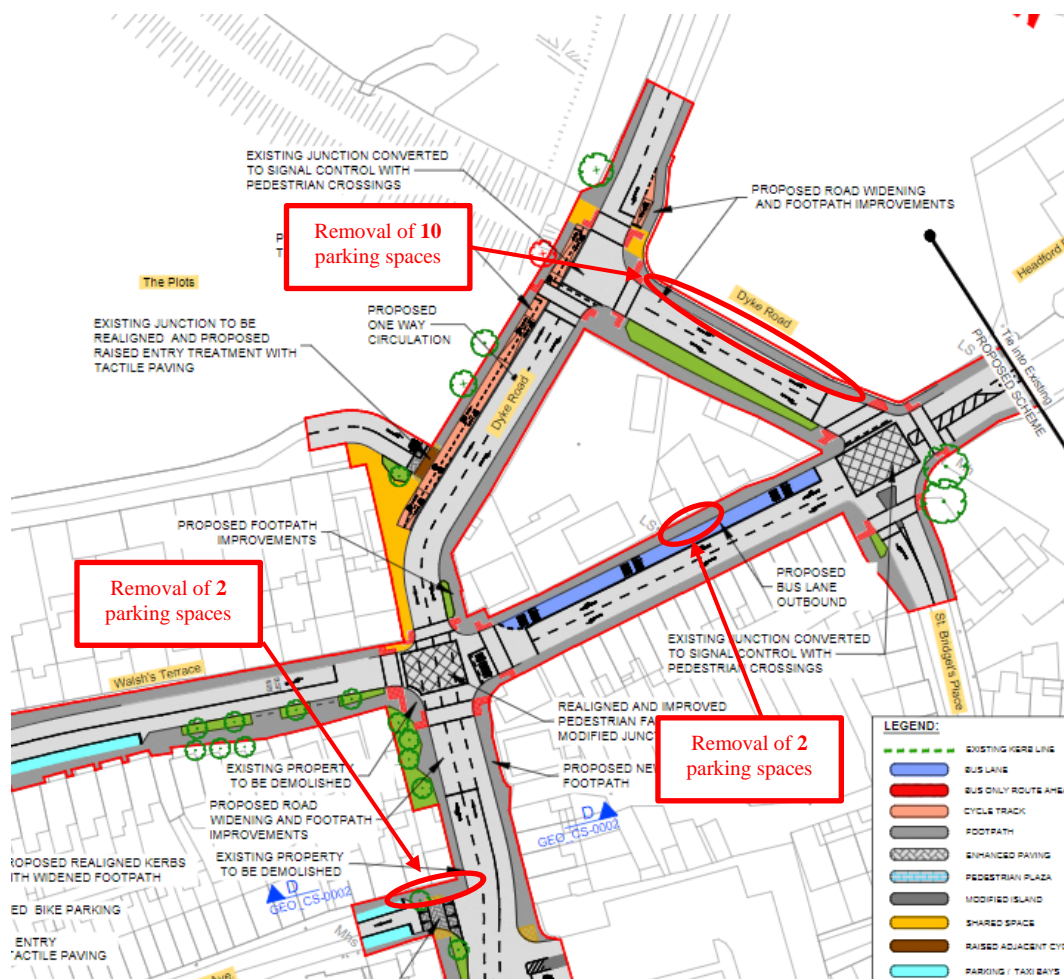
Proposed scheme design on Dyke Road and Headford Road
